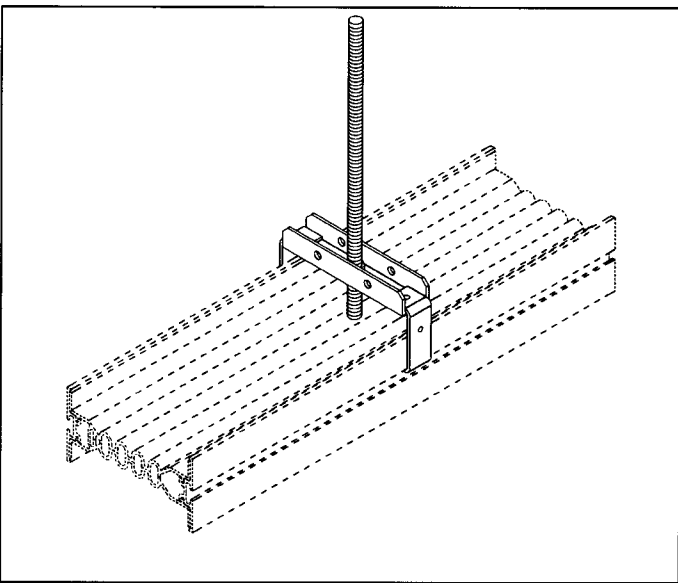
Clevis Hanger for Edgewise Mounting
